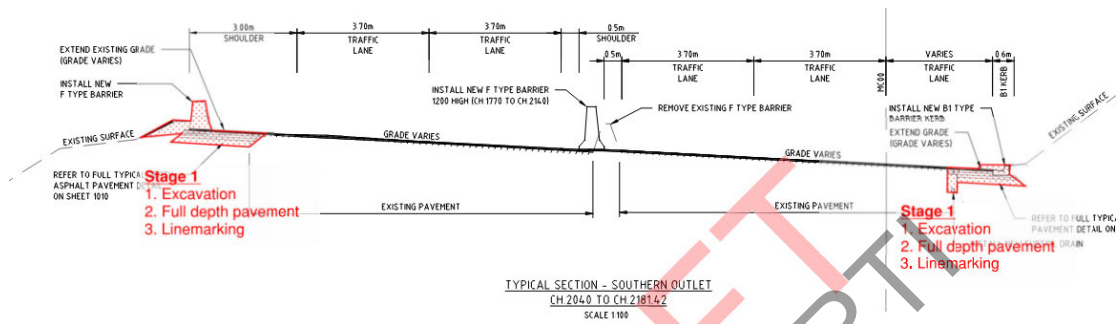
Typical section – Southern Outlet Ch. 2040 to Ch. 2181.42
